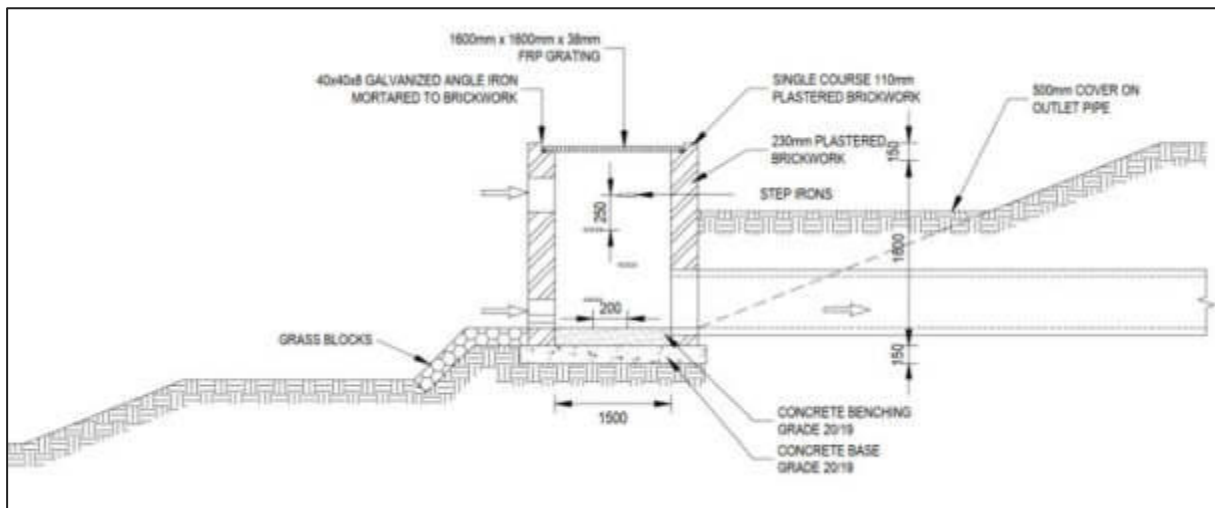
Wet Detention Pond – Typical Variable Outlet Structure
